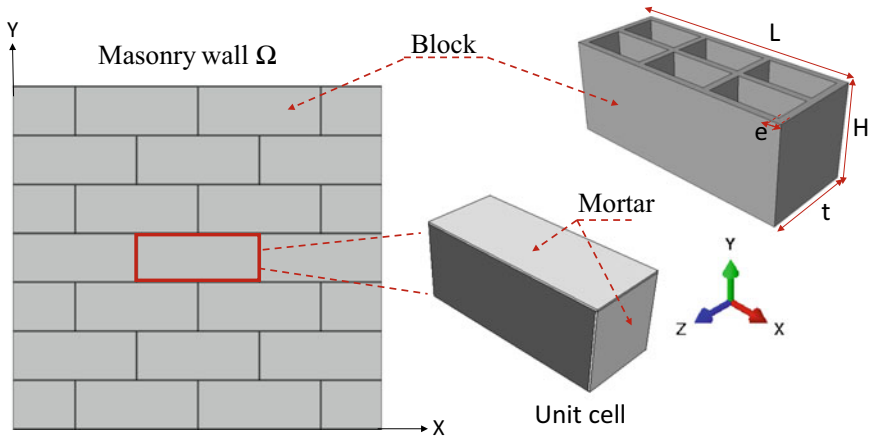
Masonry wall and the hollow blocks and the unit cell
